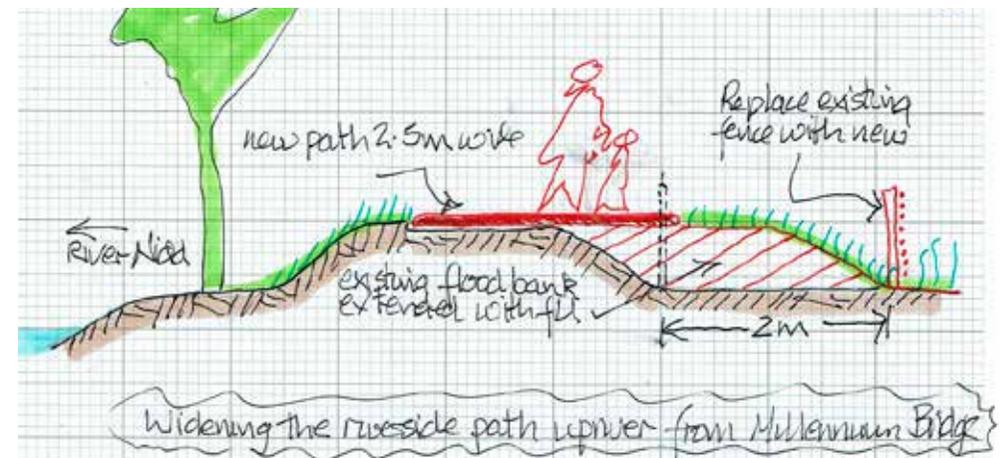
Sketch section through widened floodbank, with options of building the Greenway behind the bank
